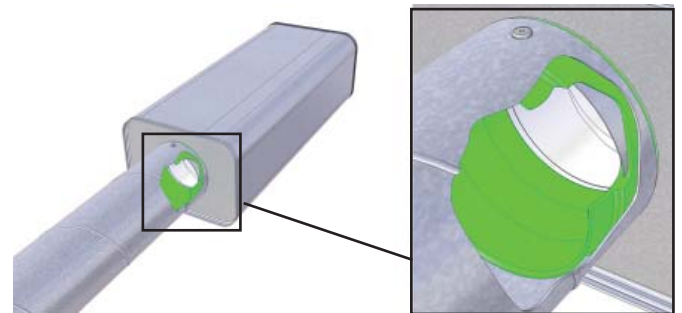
Sheet-metal edge firmly fixed in the connection spigot. For extra reliability, the joint duct should be fastened in the curled up sheet-metal edge (at least 20 mm) inside the connection spigot.
